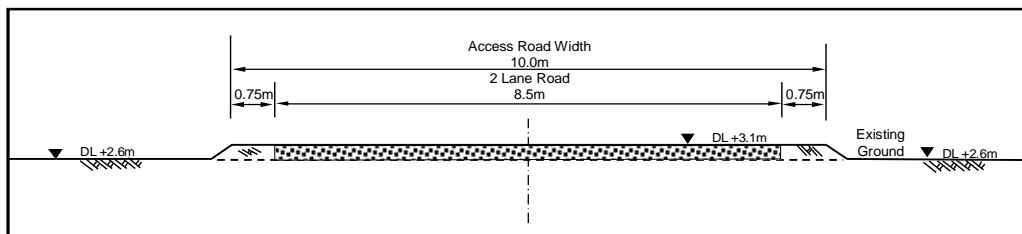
Cross Section of Bank Backside Portion of North Access Road
